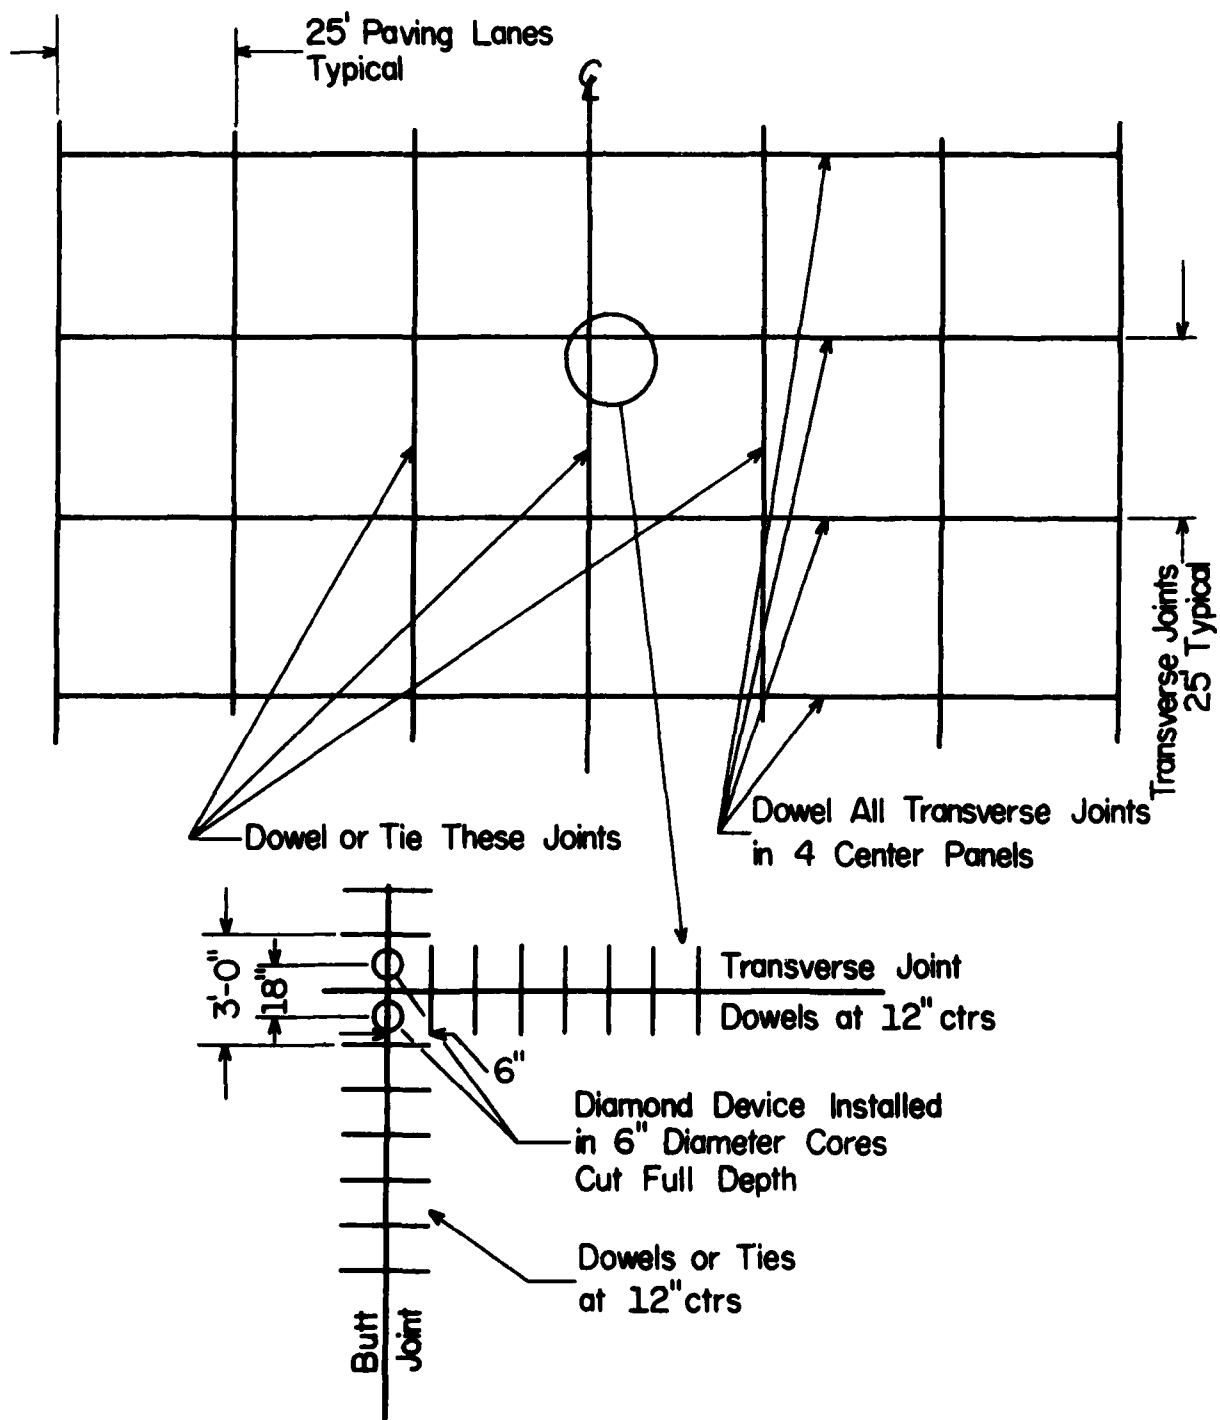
Recommended Load Transfer for Longitudinal and Transverse Joints for Airport Pavements to Serve Heavy Aircraft.
